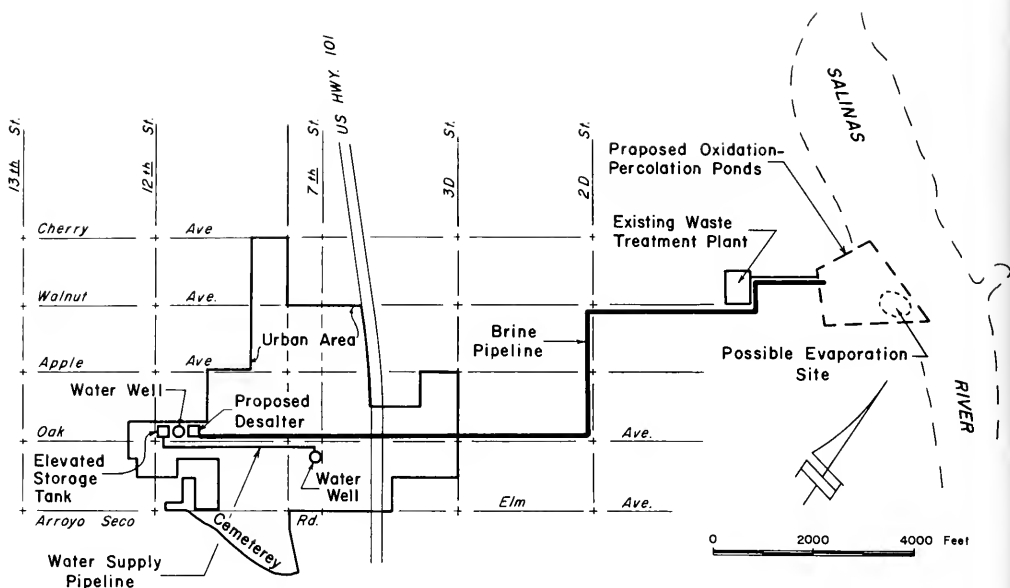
Location of Proposed Desalting Facilities at Greenfield
